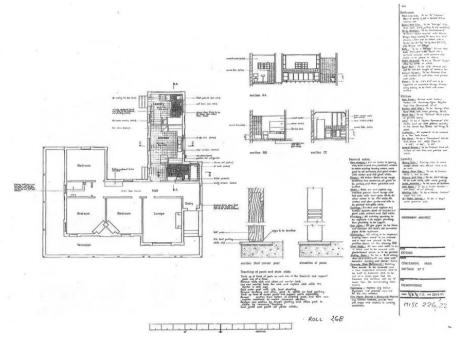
Plan showing alterations and additions to Ranger's Cottage in 1971, MISC226/22 (NSW Department of Commerce Plan Services).
